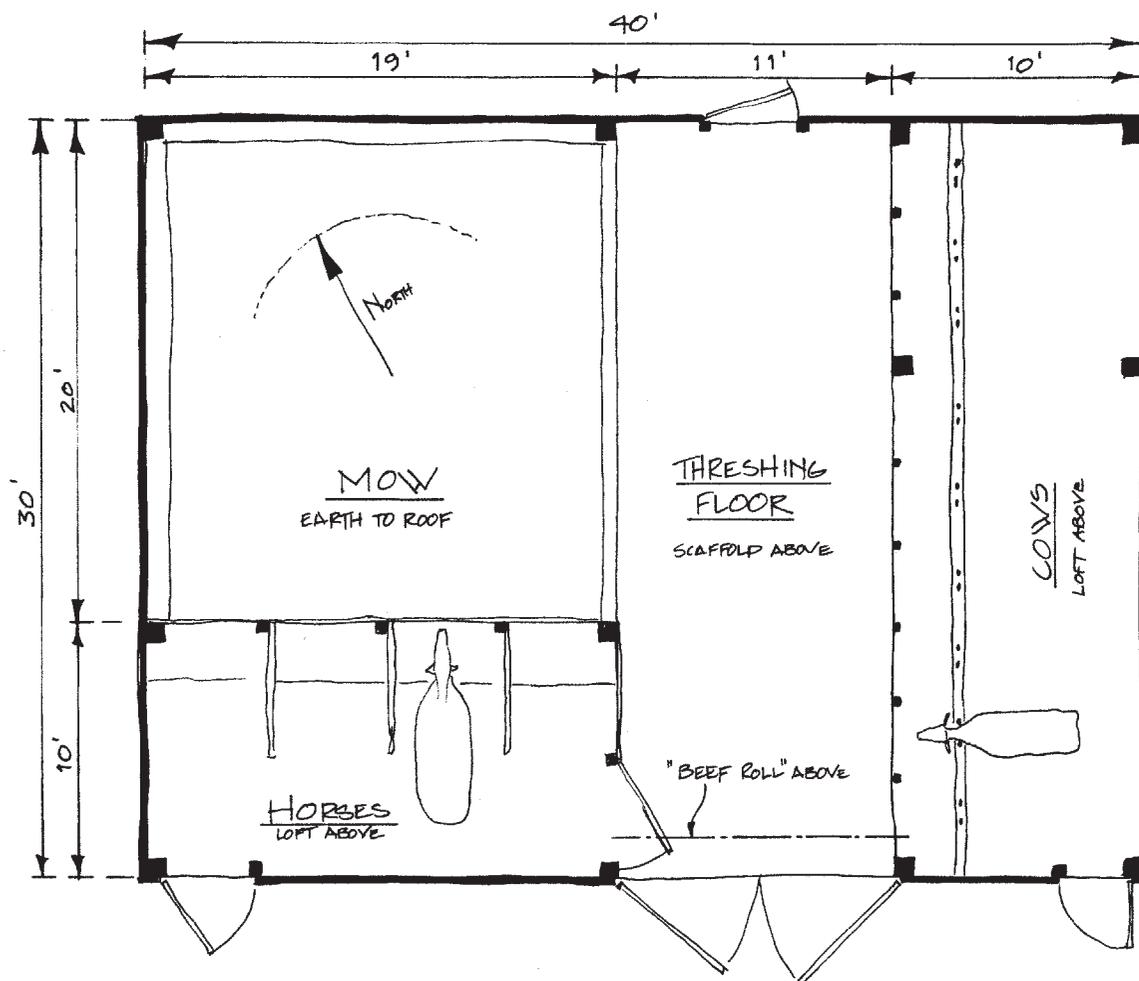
Representative plan of English barn in America, a multipurpose structure. This plan shows places for nine cows and four horses.
